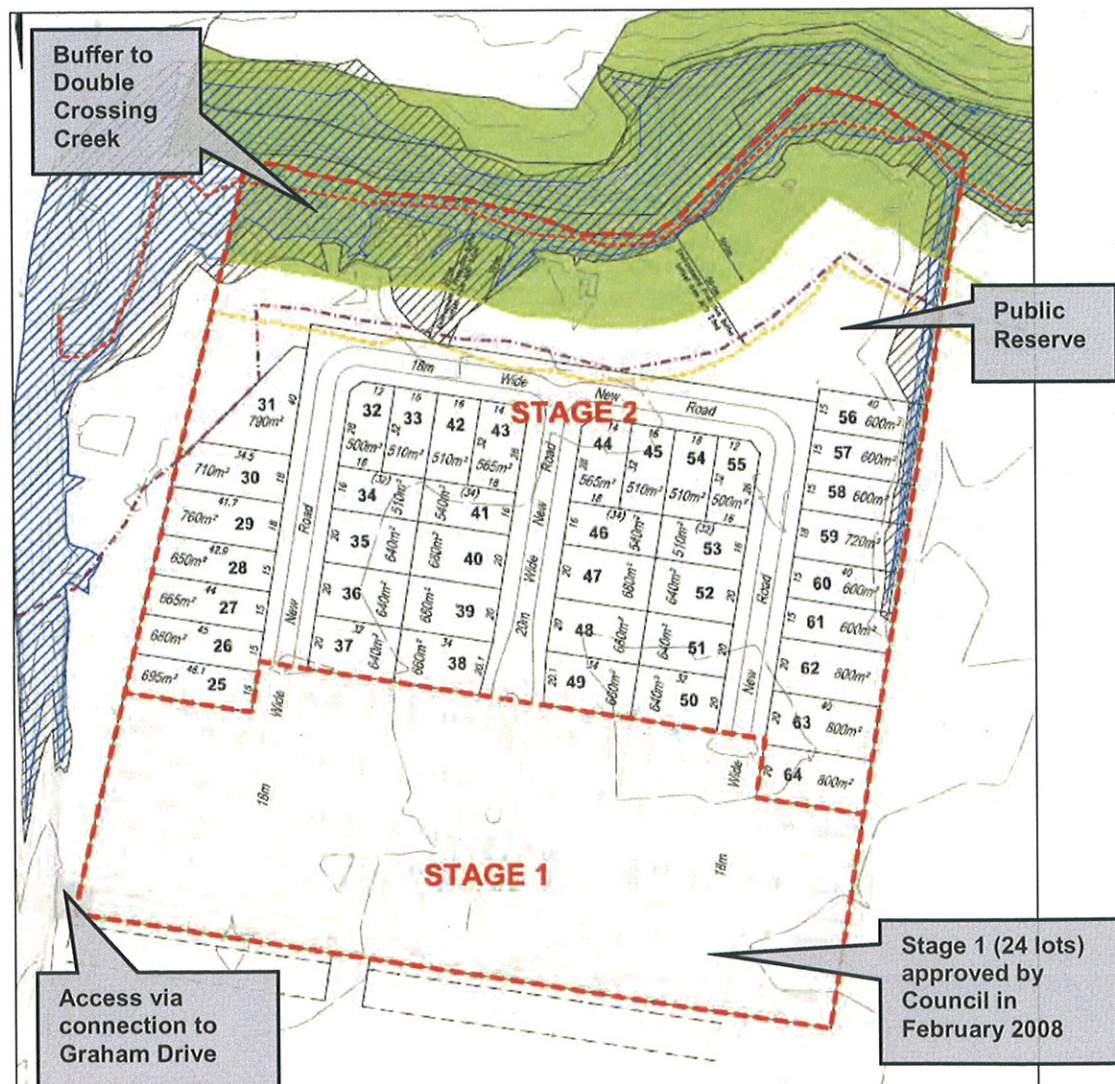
Proposed Subdivision and Road Network Layout (source: Preferred Project Report)
